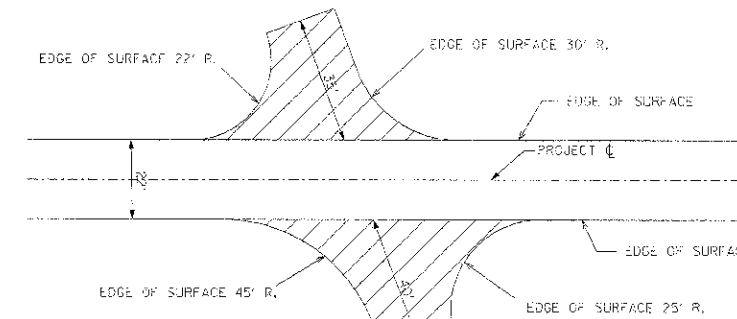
DETAIL OF INTERSECTION 13+56.5 LT AND RT
